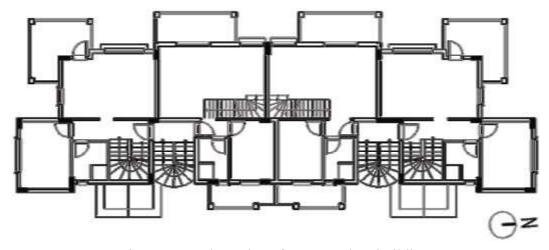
Floor plan of Case Study 8 building. Source: Architect (H. Karaca)
